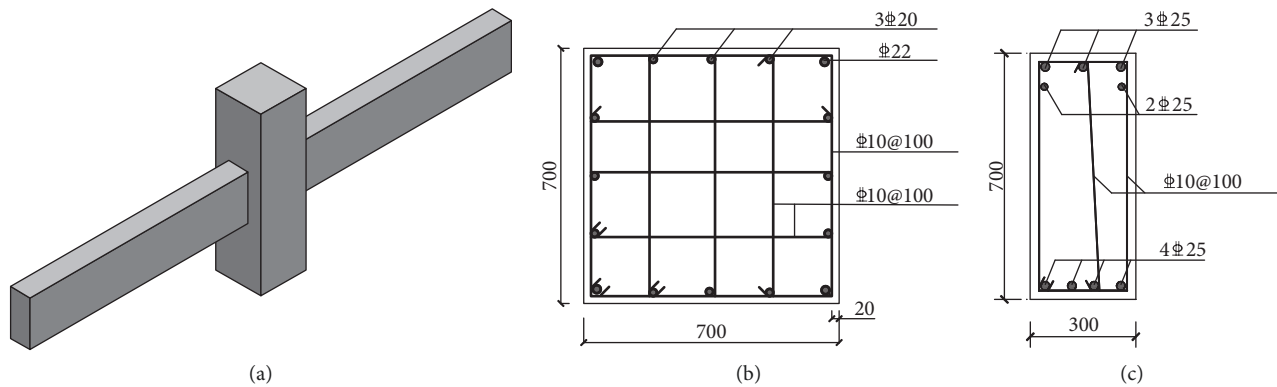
Sectional dimensions and reinforcement details of specimen XJJD: (a) schematic diagram, (b) column section, and (c) beam section.
